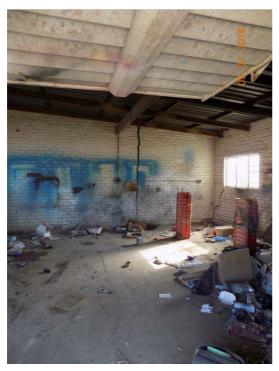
shows the interior of the garage. The floors of the existing garage are concrete.
